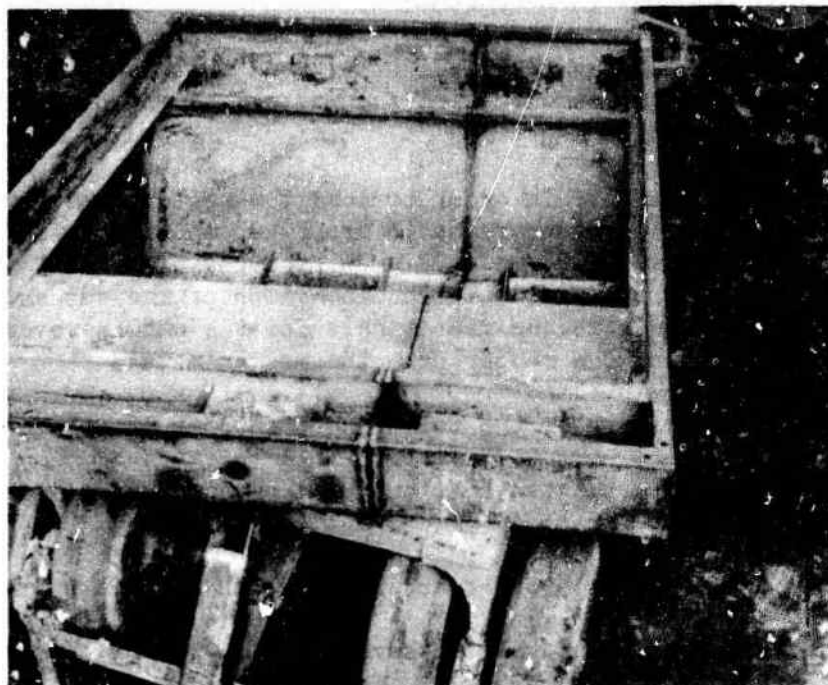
CUT OF ROLLER BODY NECESSARY FOR LOADING
